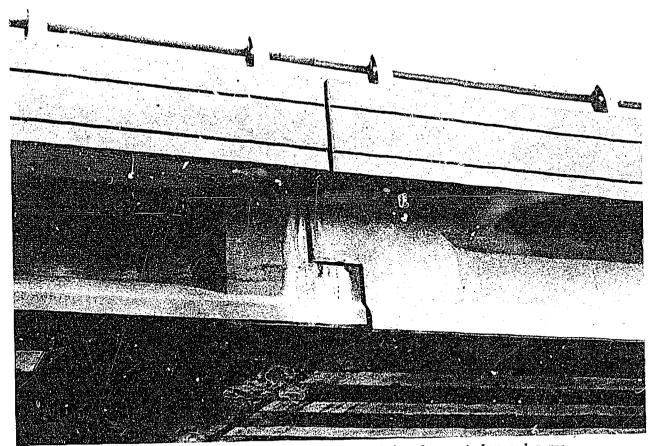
Ship-lapped cantilever between a reinforced concrete box and a prestressed concrete suspended span. Note stains caused by roadway drainage. This may be a source of future deterioration.
